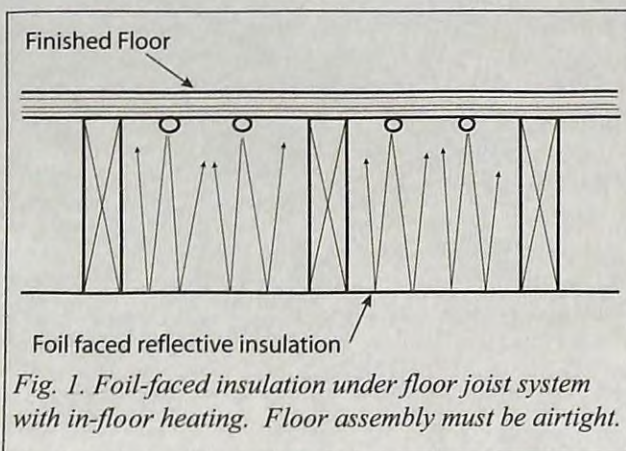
Foil-faced insulation under floor joist system with in-floor heating. Floor assembly must be airtight.
